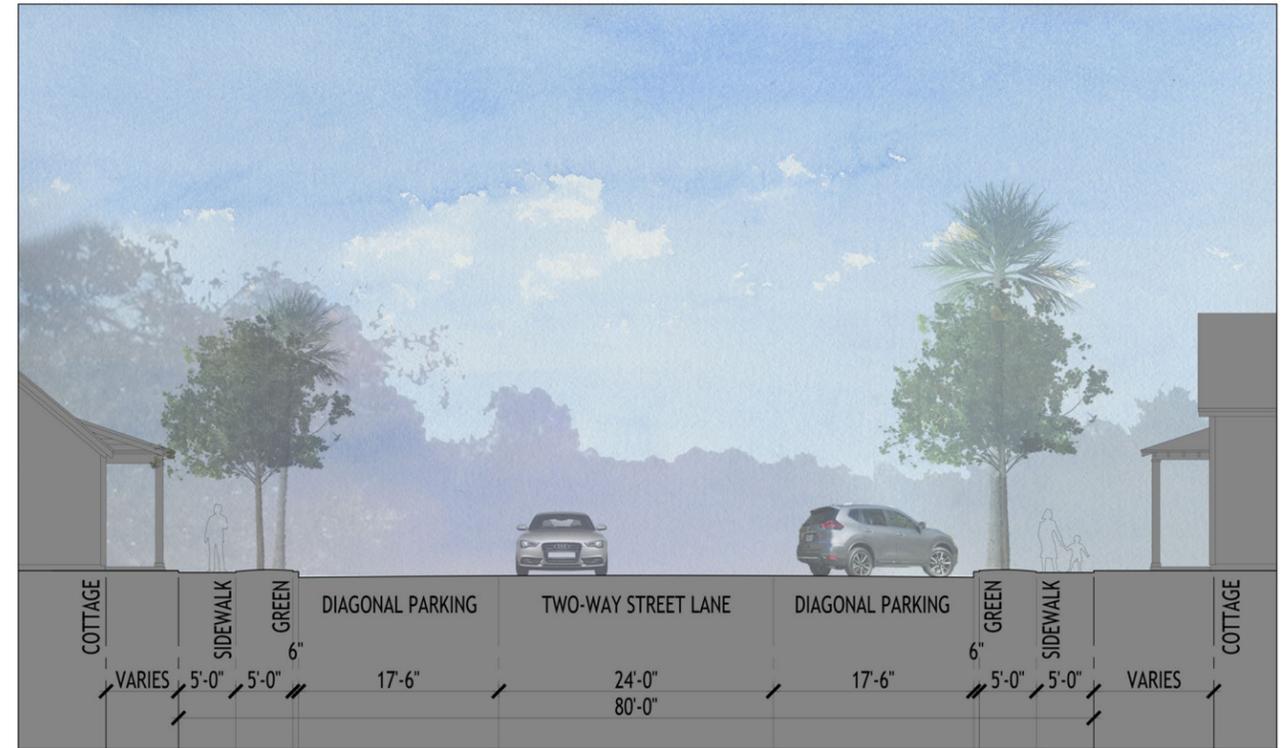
# EXHIBIT H: TYPICAL STREET SECTION & PLAN VIEW
